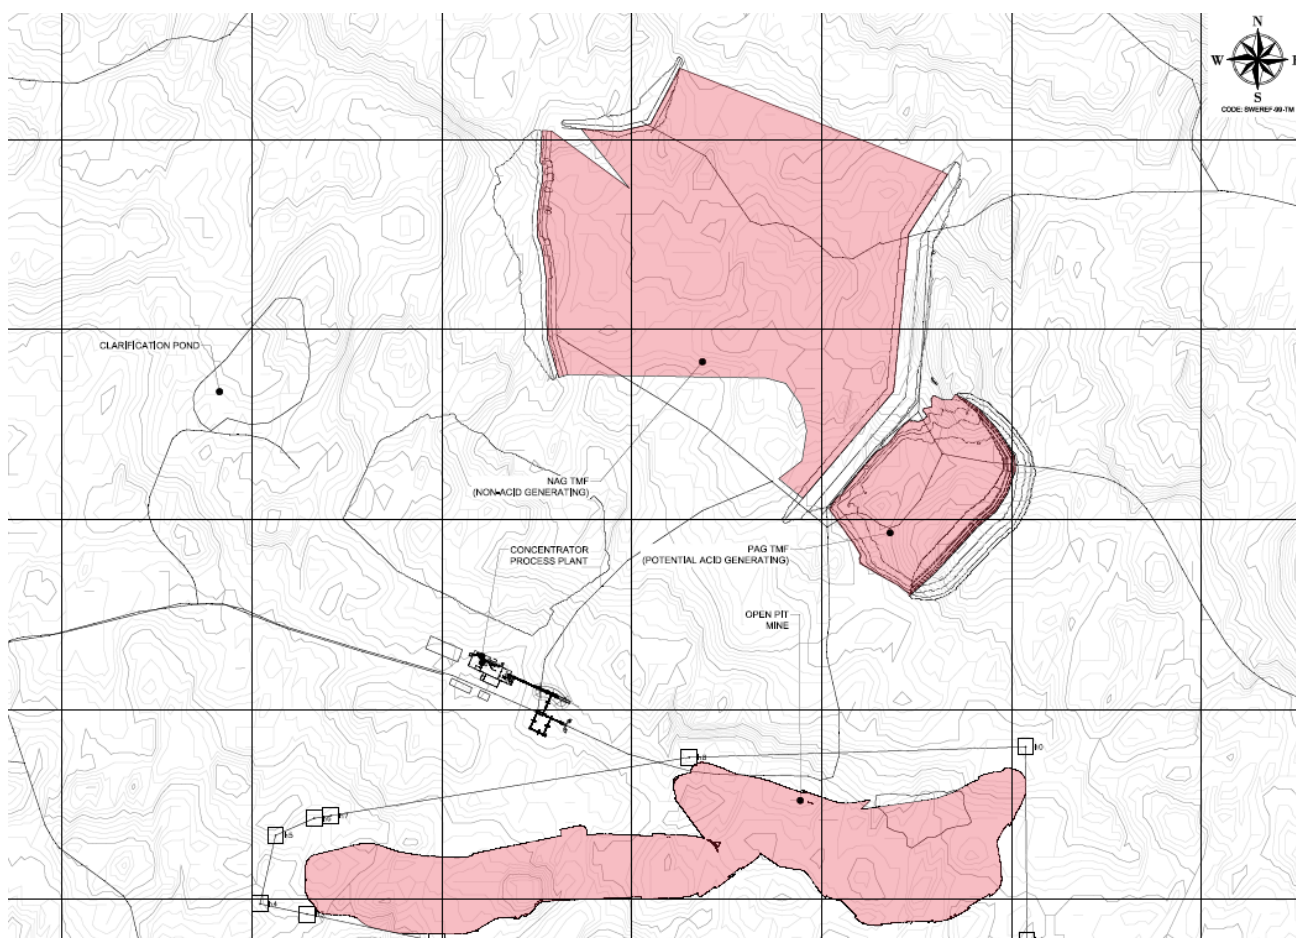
Site plan for the Kringle Mining and Beneficiation facilities
